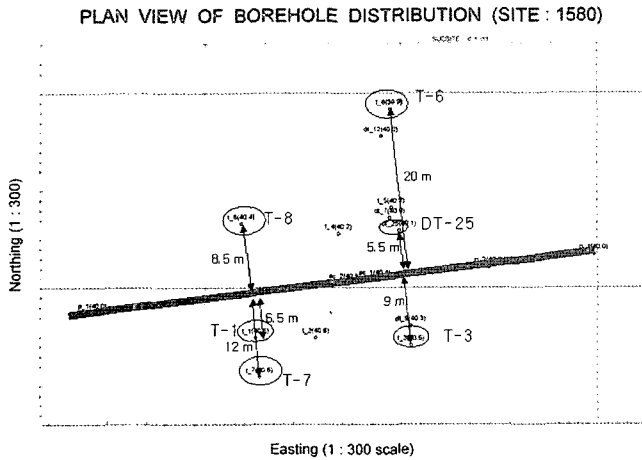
Plan view of borehole distribution and tunnel location (a thick straight line) of the site A.
